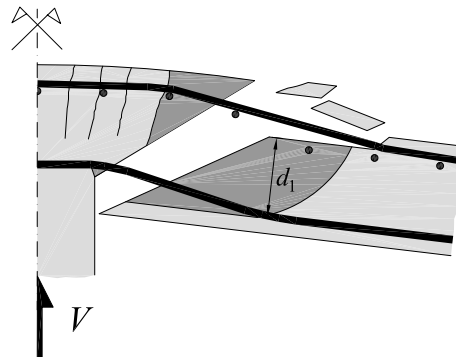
Critical zone of concrete breakout over integrity reinforcement
